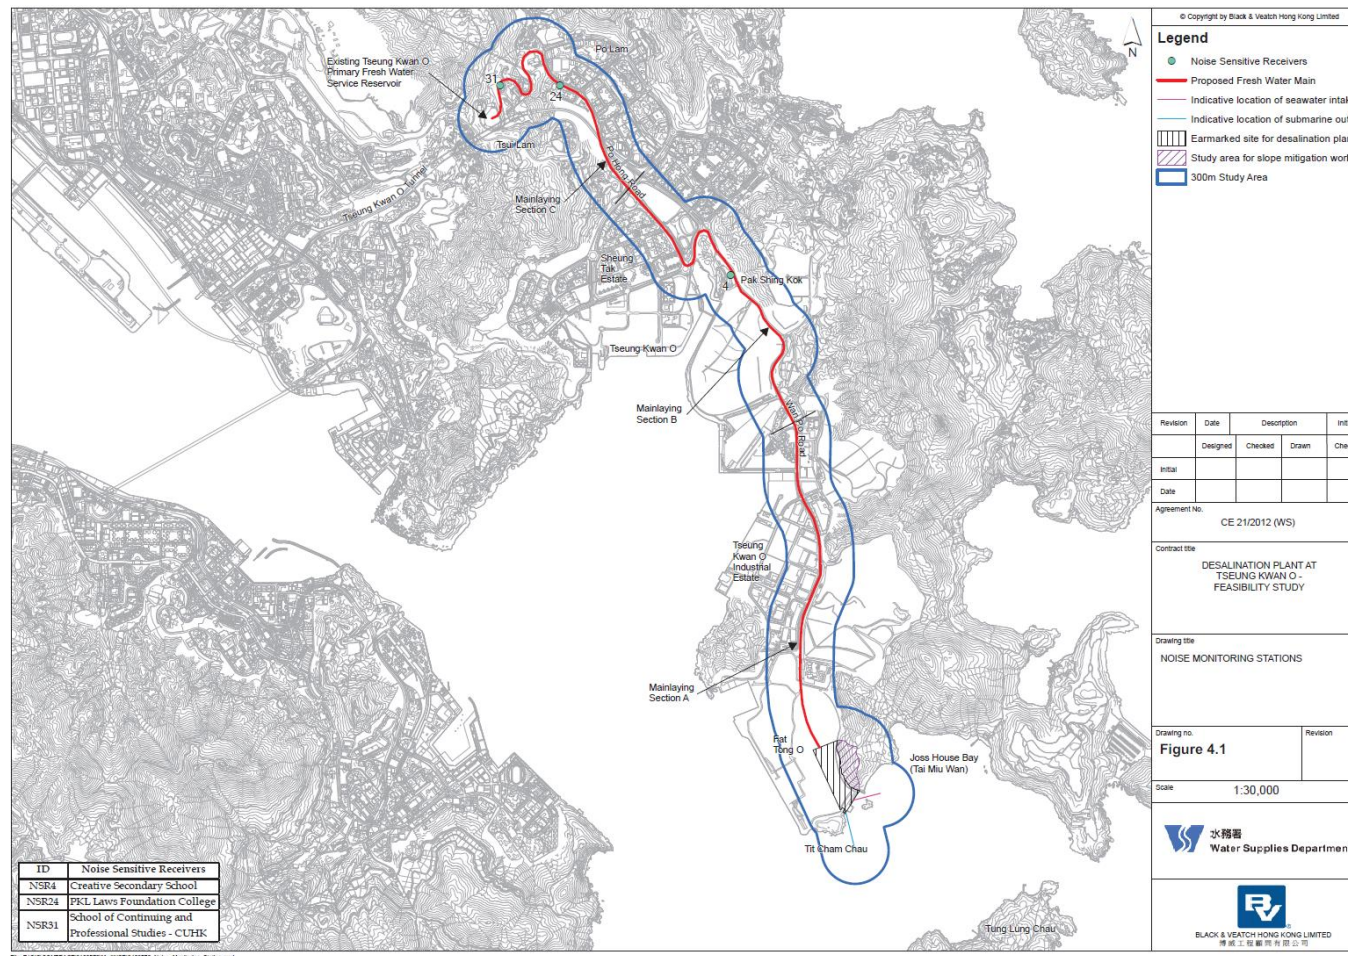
Site Layout Plan with Noise Sensitive Receivers and Desalination Plant
